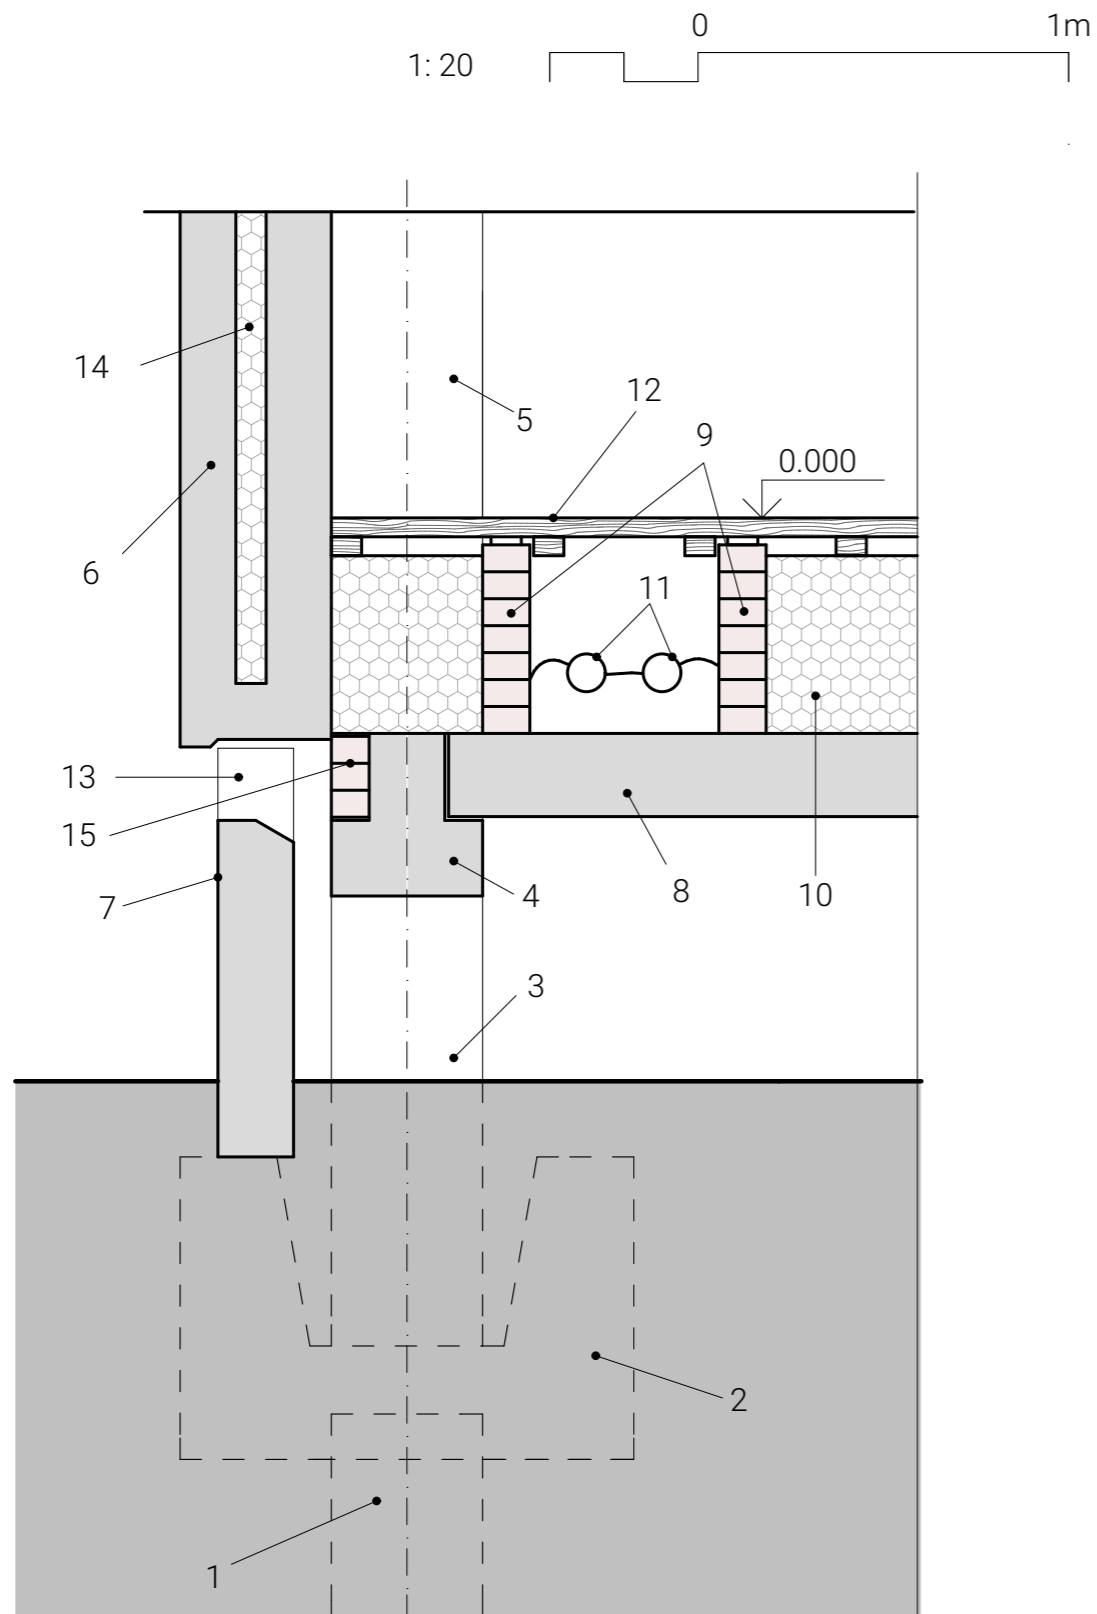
A detail of the stilt foundation: 1- stilt, 2- grillage, 3- column sill, 4- header, 5- column, 6- wall panel, 7- basement screen, 8- slab, 9- brick wall, 10- foam glass insulation, 11- pipes, 12- wooden floor, 13- ventilation, 14- polystyrene foam slab, 15- bricks (Vaskovskij A. P. Shkliarov N. D. 1979)
